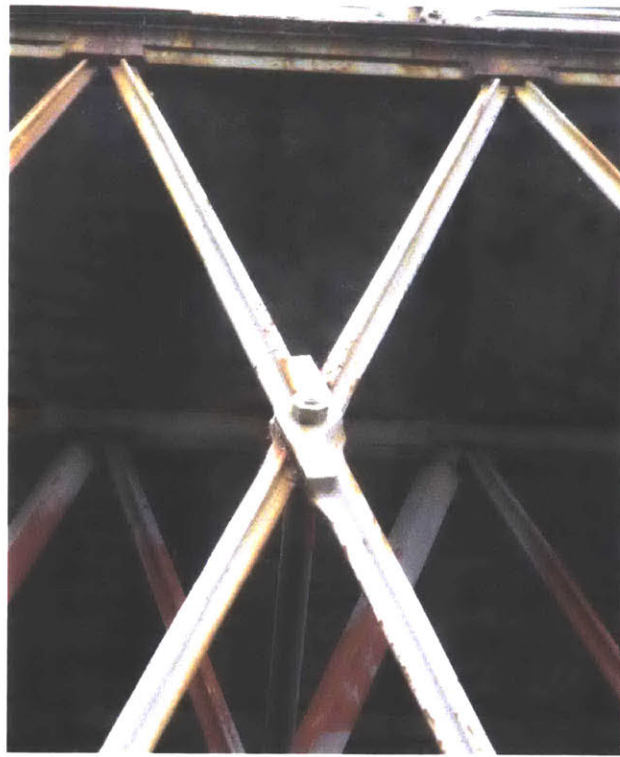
Mythe Bridge – lattice bracing midspan connection (Lane 2017)
